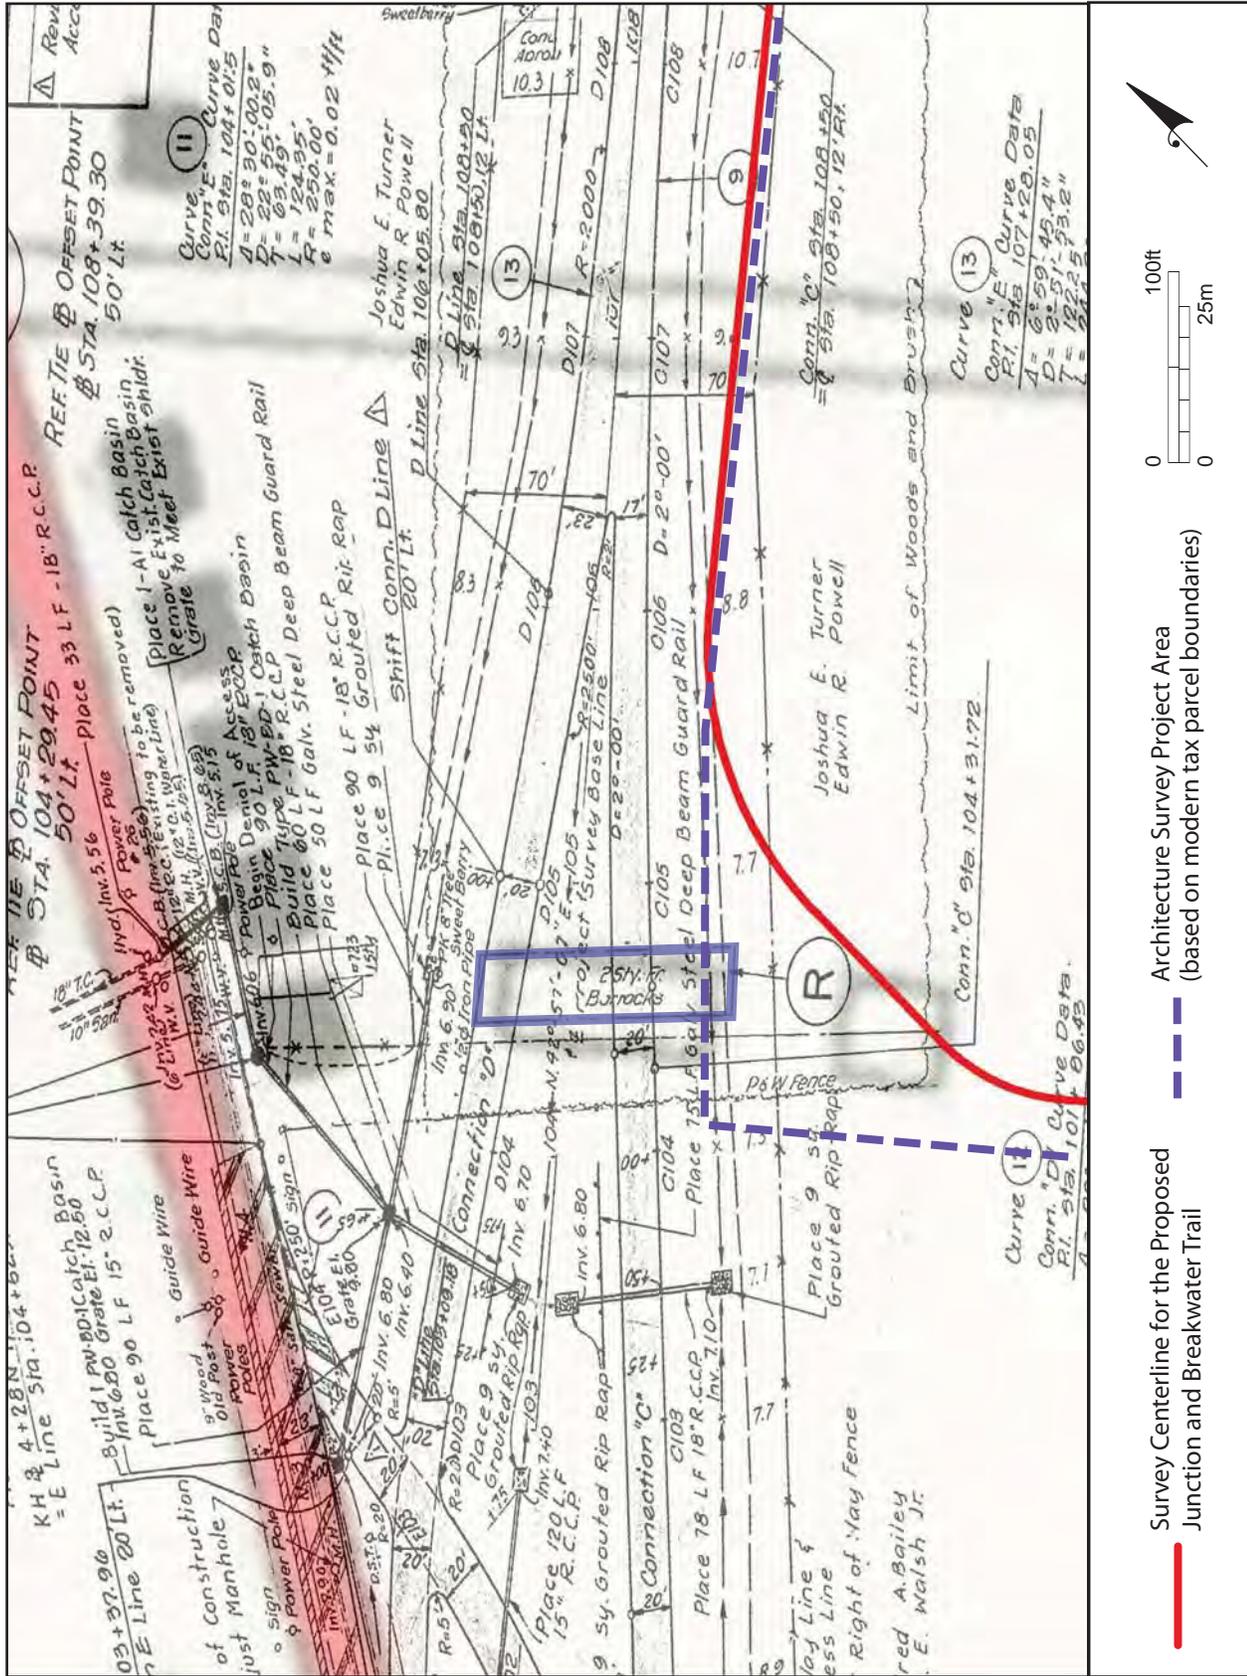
Detail of 1964 construction plan for the proposed Freeman Highway highlighting a building on the east side of the roadway labeled as "Barracks" that once stood near the project area (State Highway Department 1964).
